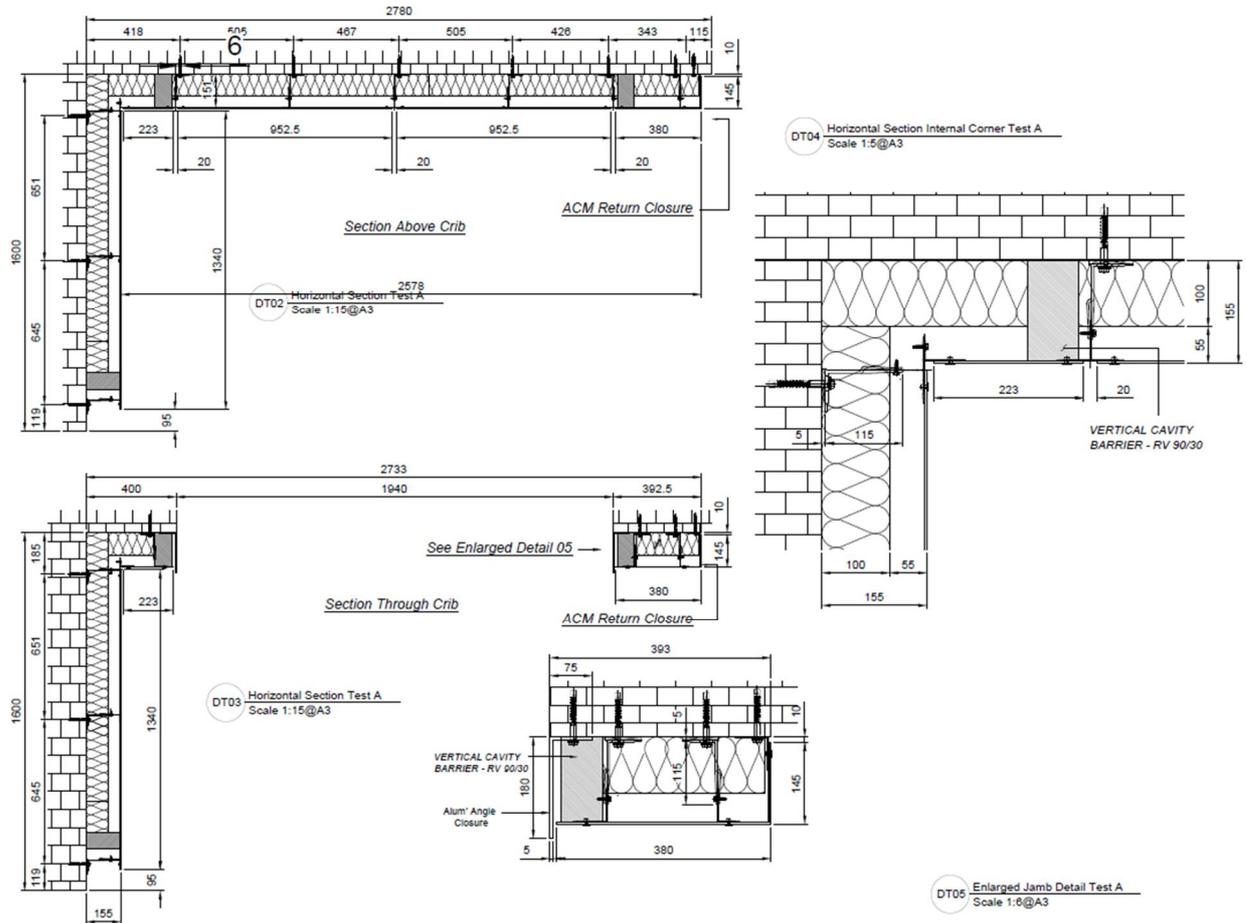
Horizontal section through and above the combustion chamber, and installation details for the system (supplied by the Test Sponsor).
